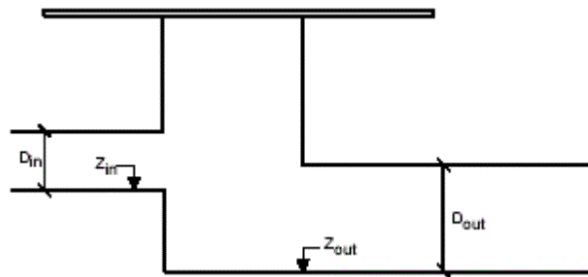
Manhole with difference in elevation of inlet and outlet links (DHI, 2000)
